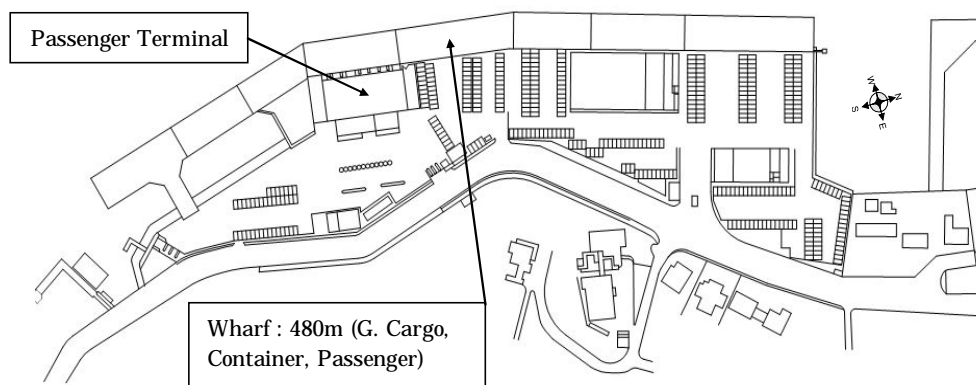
Existing Layout at Balikpapan Port
